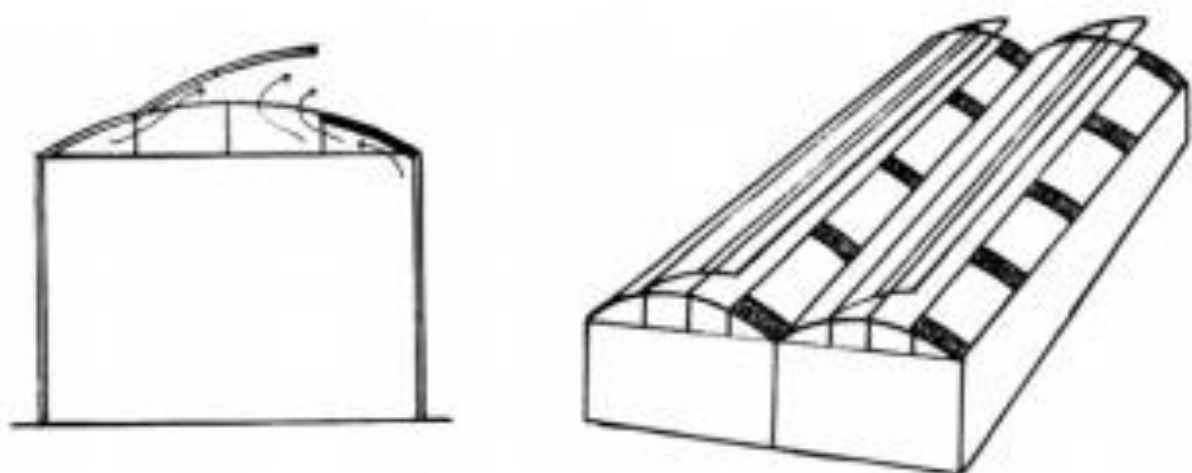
Integration of PV/T collectors on greenhouse roof [9]
